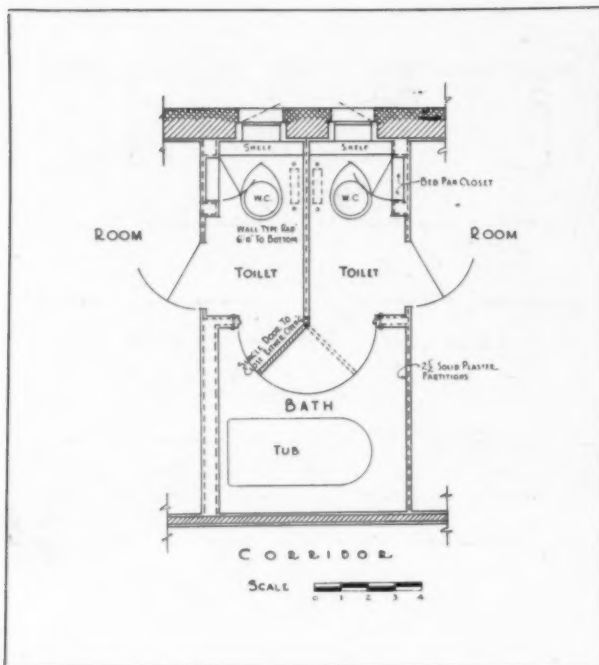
Plan Showing Private Rooms with Common Bath Controlled by Single Door
